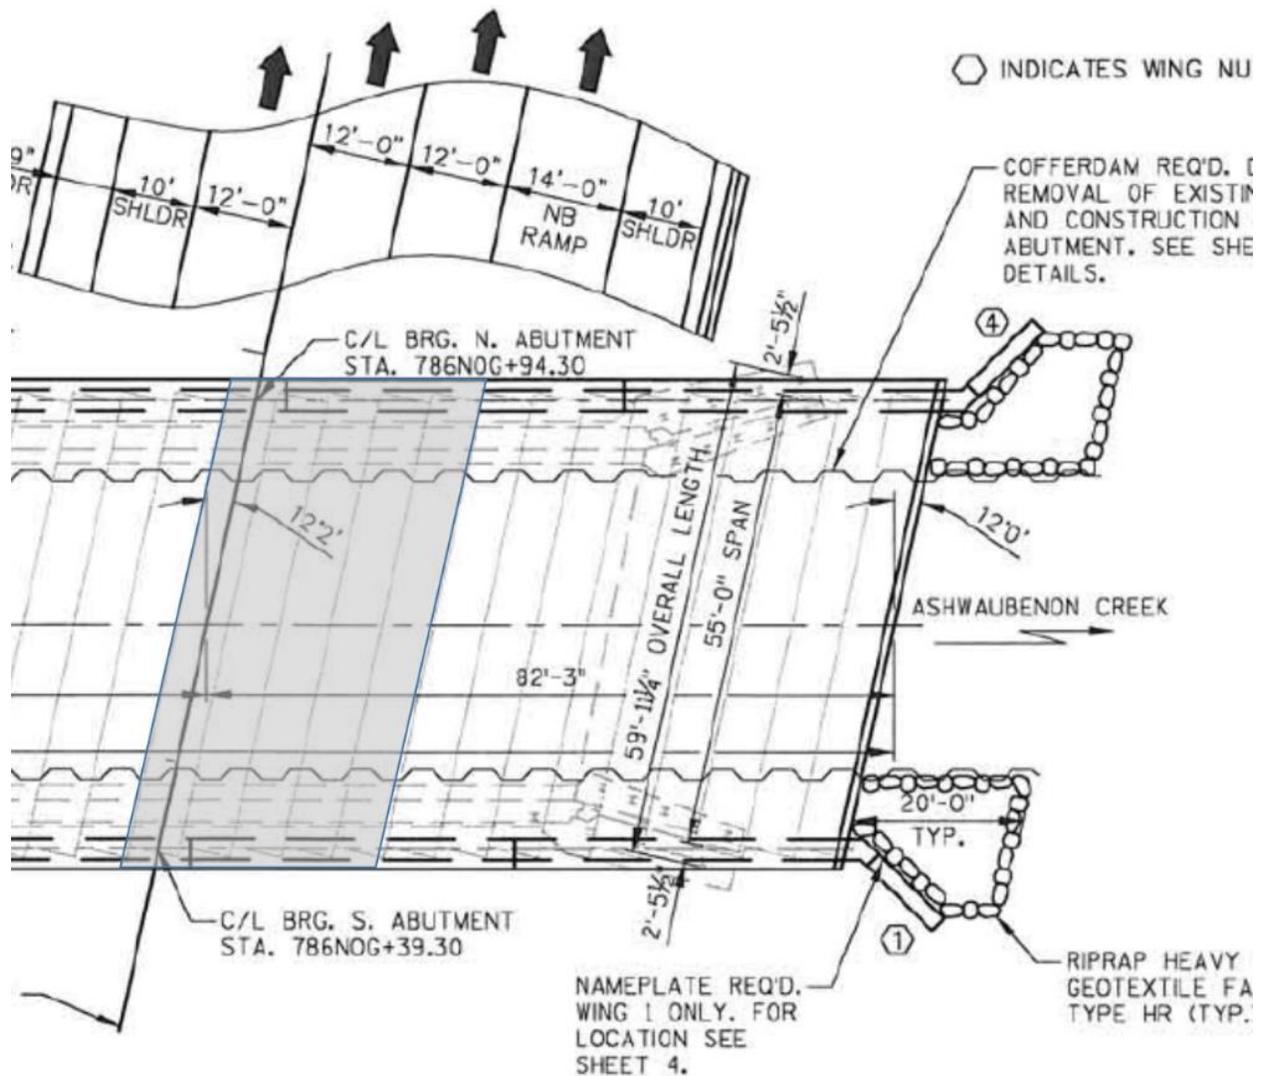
US 41 over Ashwaubenon Creek instrumented panels
